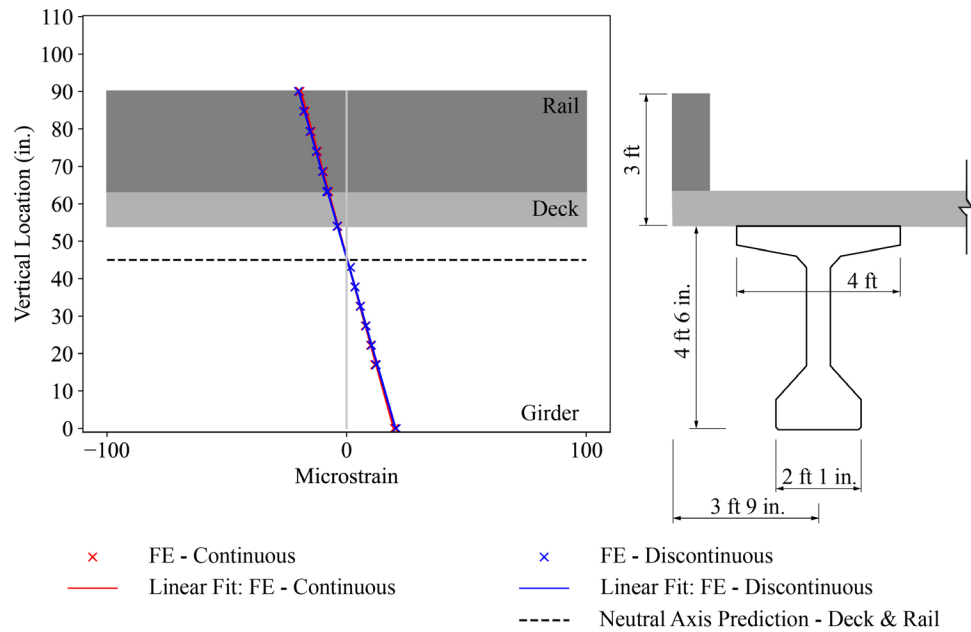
Effect of rail discontinuity for three-span continuous prestressed concrete girder bridge with PS-2 rail: FE predictions for strains at peak positive moment location.
